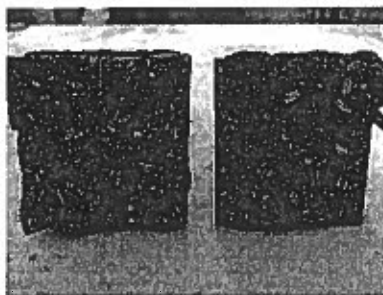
Cracking texture of particle board wall mixed with cement and cassava pit waste after
